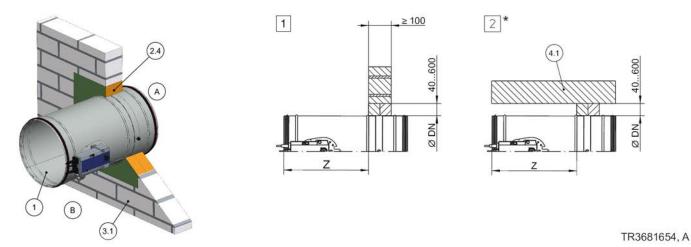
Dry mortarless installation with fire batt into a solid wall
